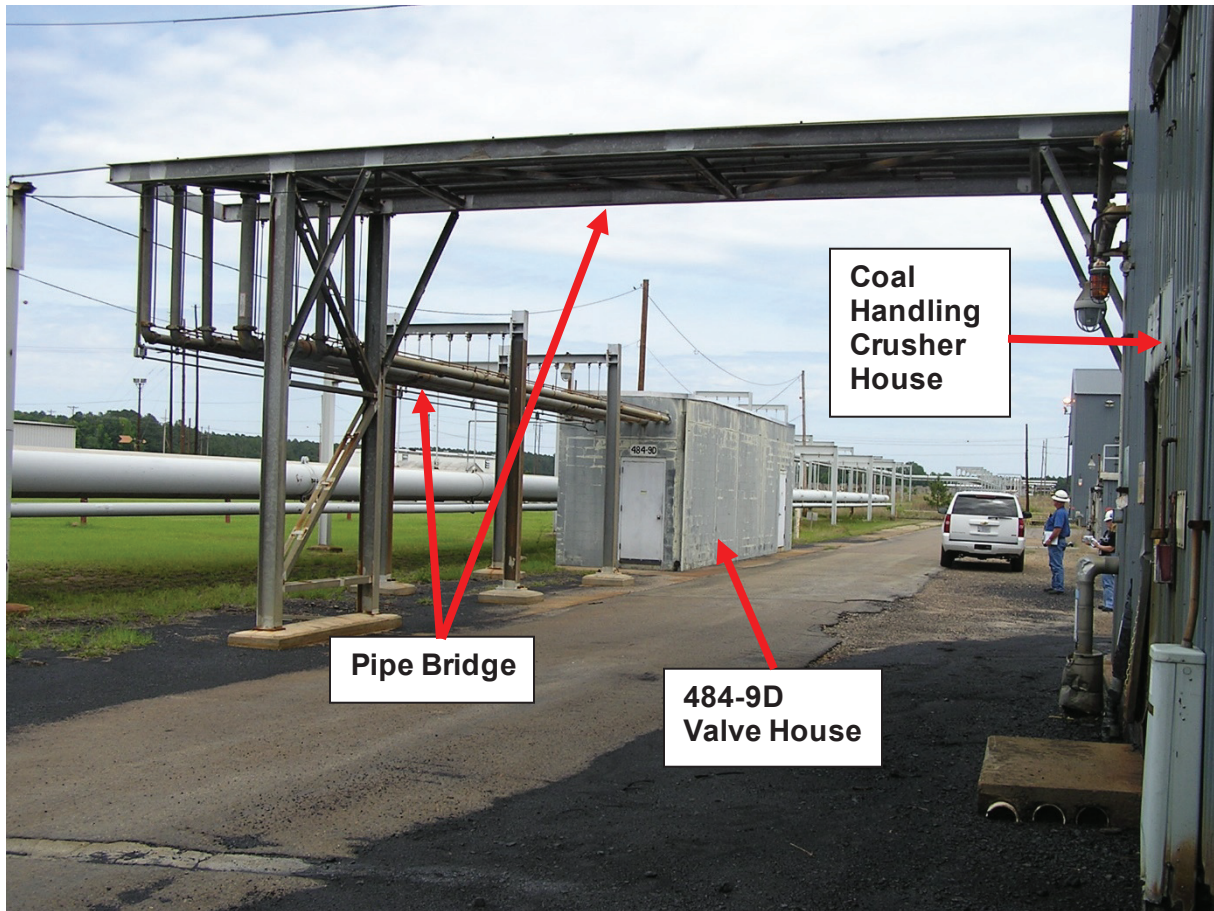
Building 484-9D, D-Area Vale House (Looking East)
